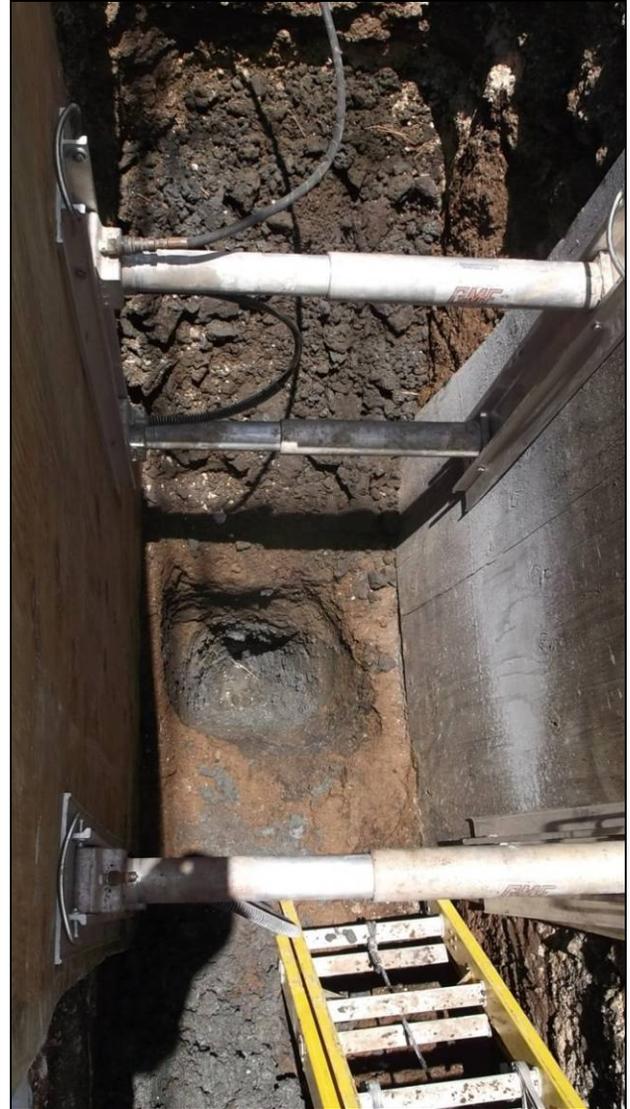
T-093 overhead view of shoring system and excavation into Stratum IIb
